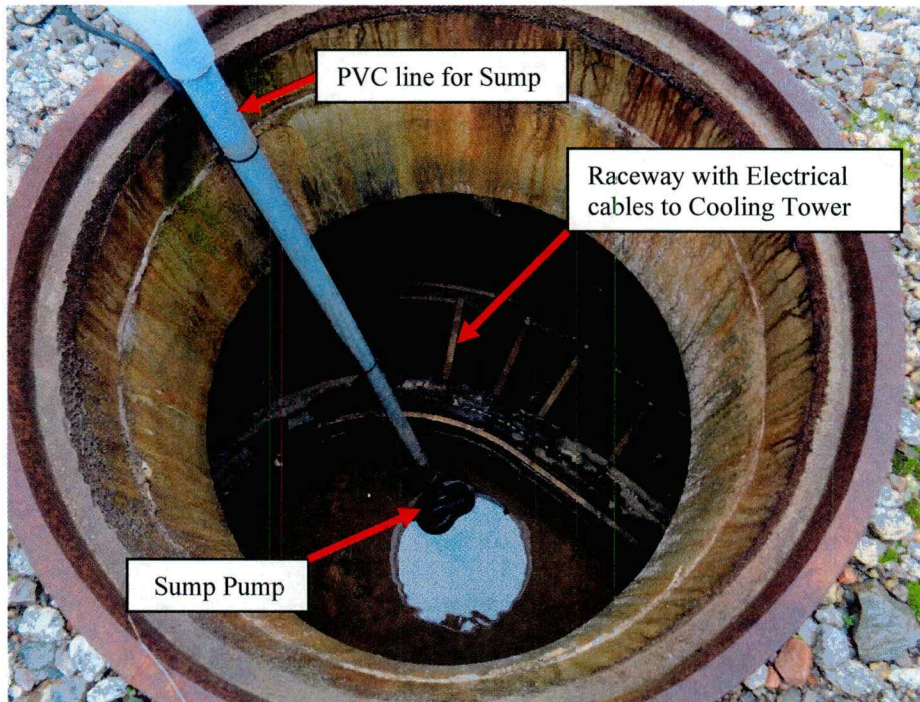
Inside Manhole Between Buildings 233-23H and 233-24H
